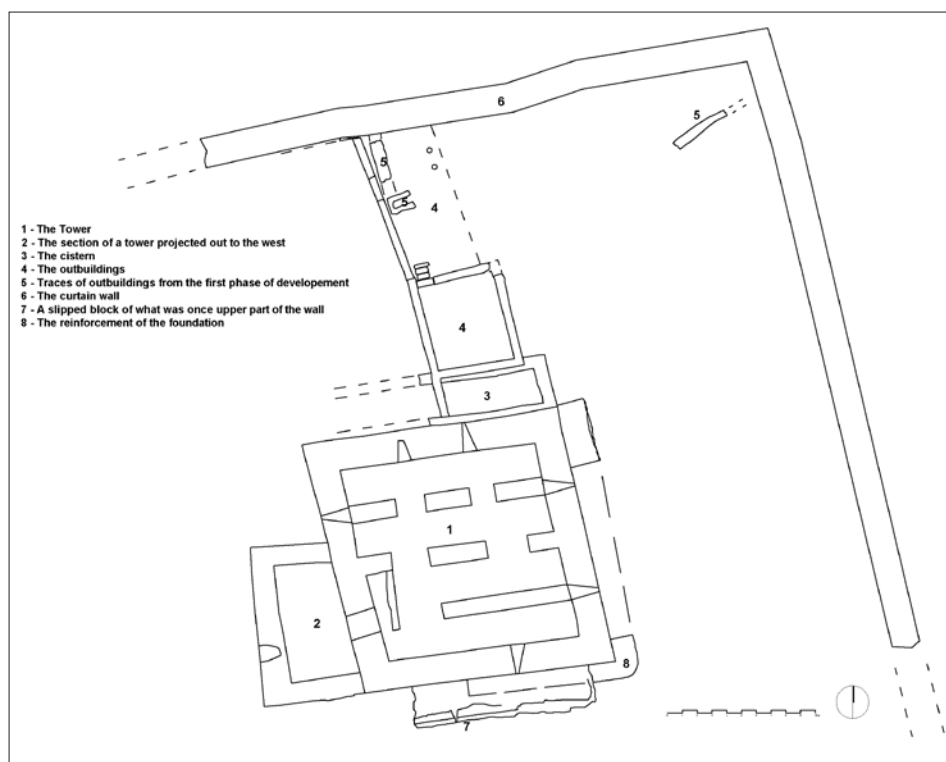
Ground plan of the fortification (drawing by: J. Višnjić)
